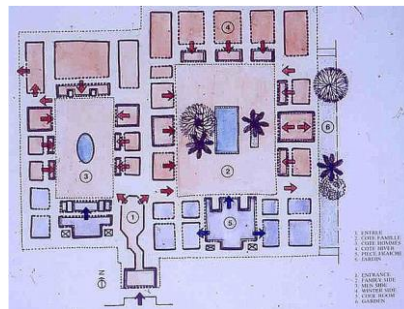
Sample of an Iranian traditional house plan (Rabbat, n.d.).
